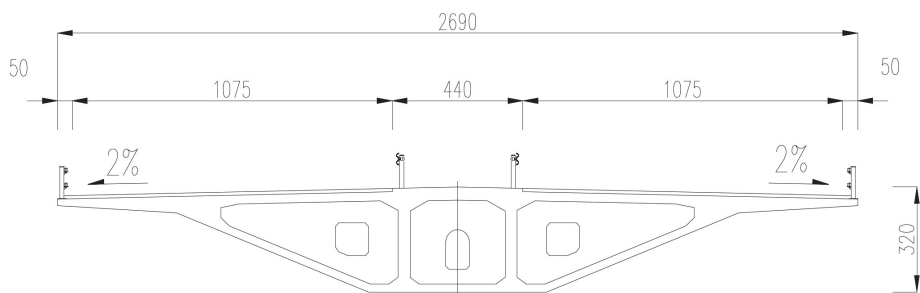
Cross section of the cable-stayed bridge (unit: cm).
